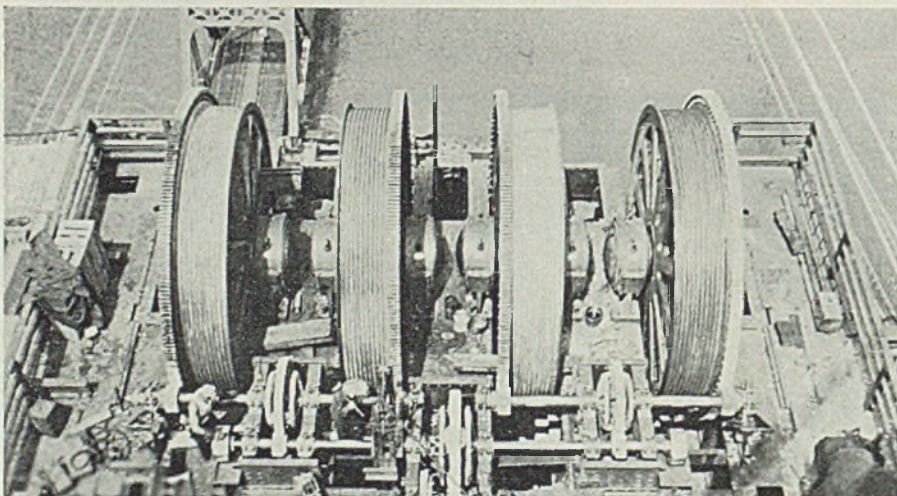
One group of four 15-foot diameter main sheaves being installed atop one tower of the Cape Cod canal vertical-lift railway bridge
